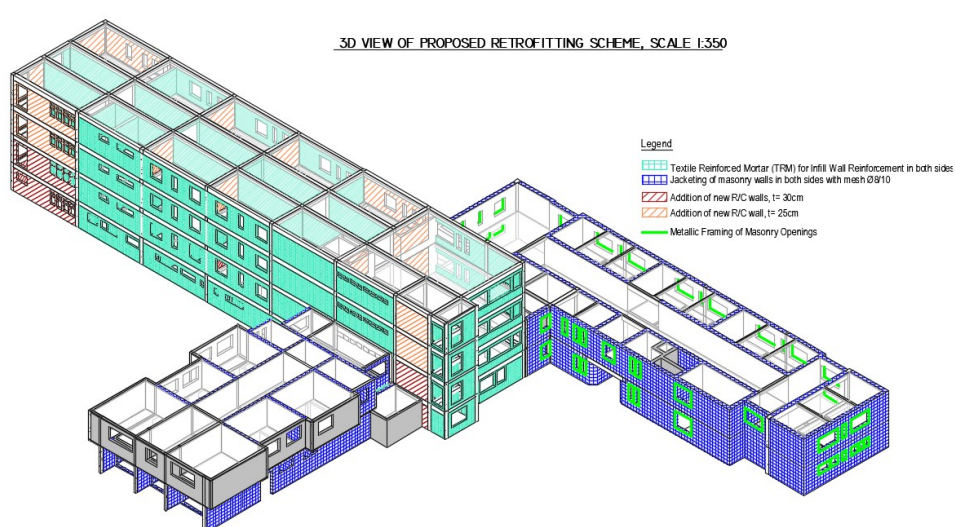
Proposed scheme for implementing the rehabilitation structural interventions.
